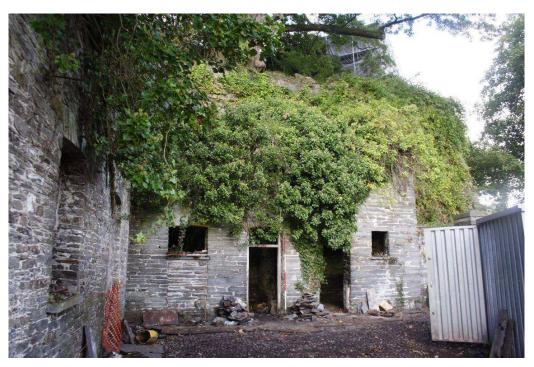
Southeastern facade of Rooms 1 and 2 of the Stables, with Eastern Curtain Wall of Cardigan Castle behind, 2m scale
